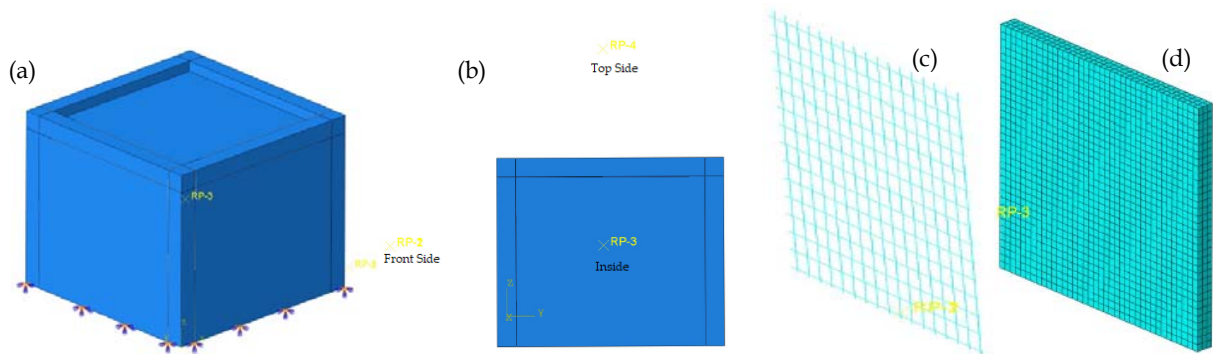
Building frame with (a) fixed boundary conditions, and (b) locations of blast, (c) Shear wall reinforcement, and (d) concrete
